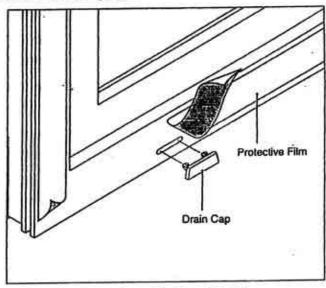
How to remove the protective film and install the drain caps — exterior view
